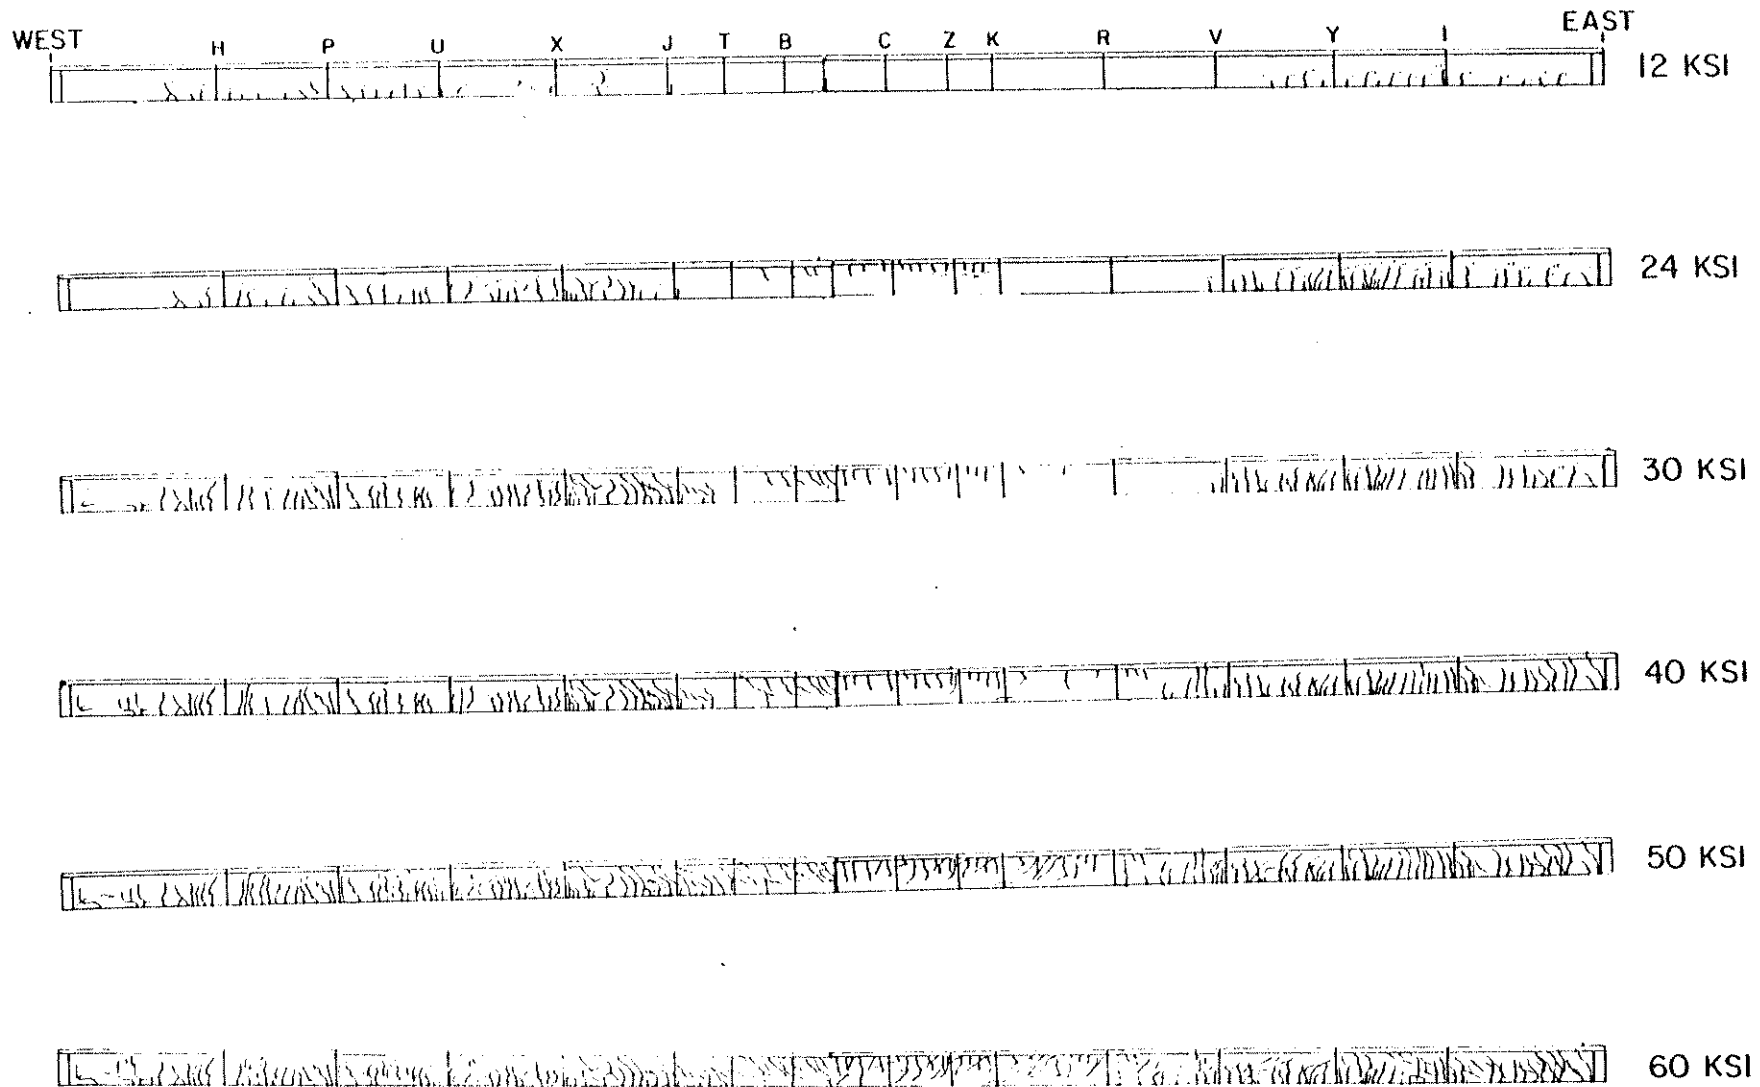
CRACK HISTORY FOR GIRDER I (SOUTH FACE)
